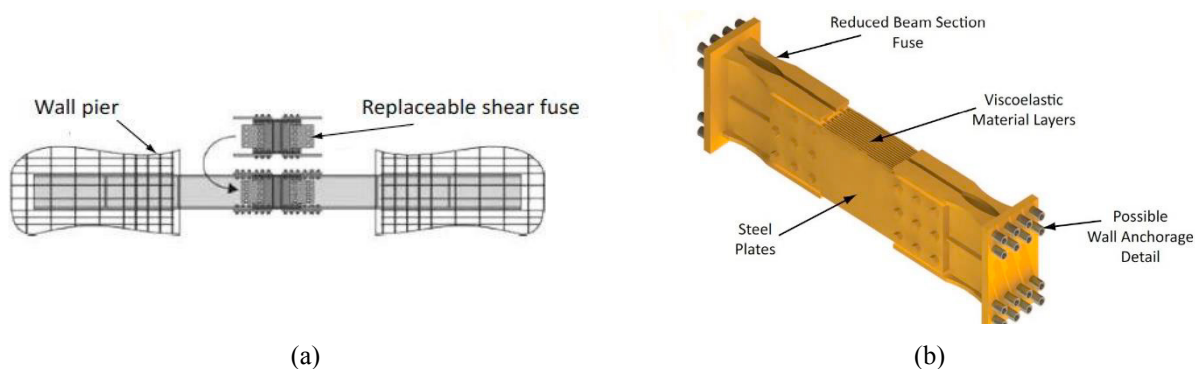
(a) RSCB concept for steel coupling beams based on Shahrooz et al. (2018) and (b) Viscous coupling damper adapted from Montgomery & Christopoulos (2014).
